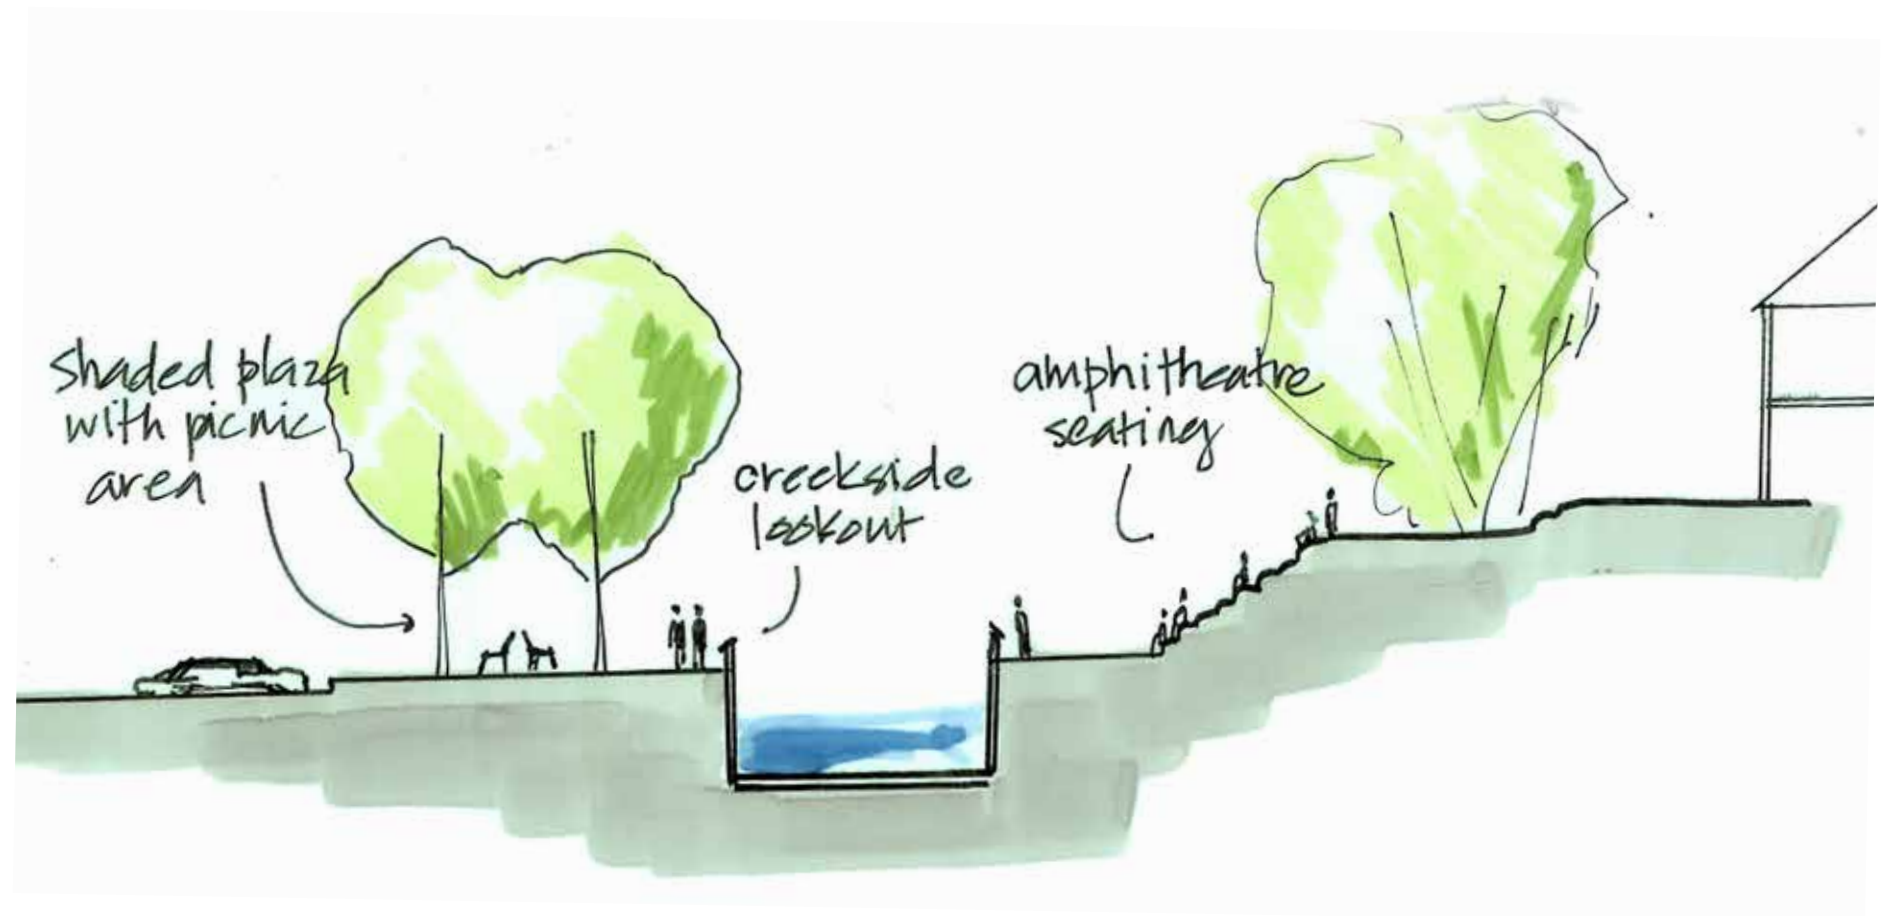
Section: Rail Yard Plaza to Superintendent's House Park
